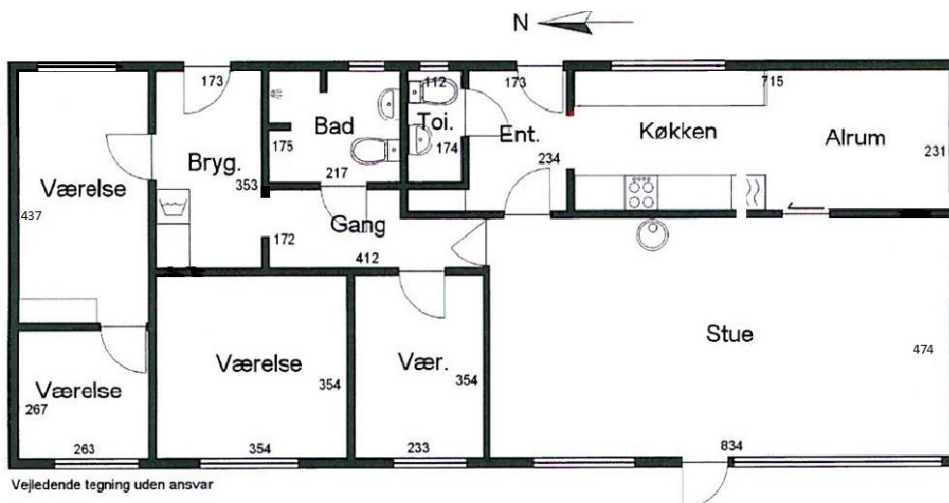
Floor plan and orientation of single family house at Langørvæget 1.
